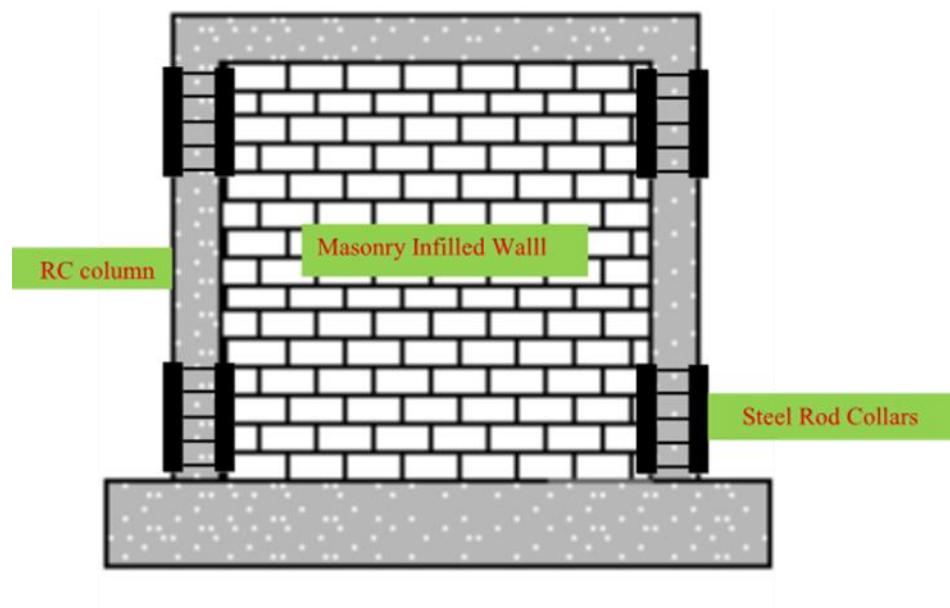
Masonry infilled wall with strengthened column by steel-rod collars
